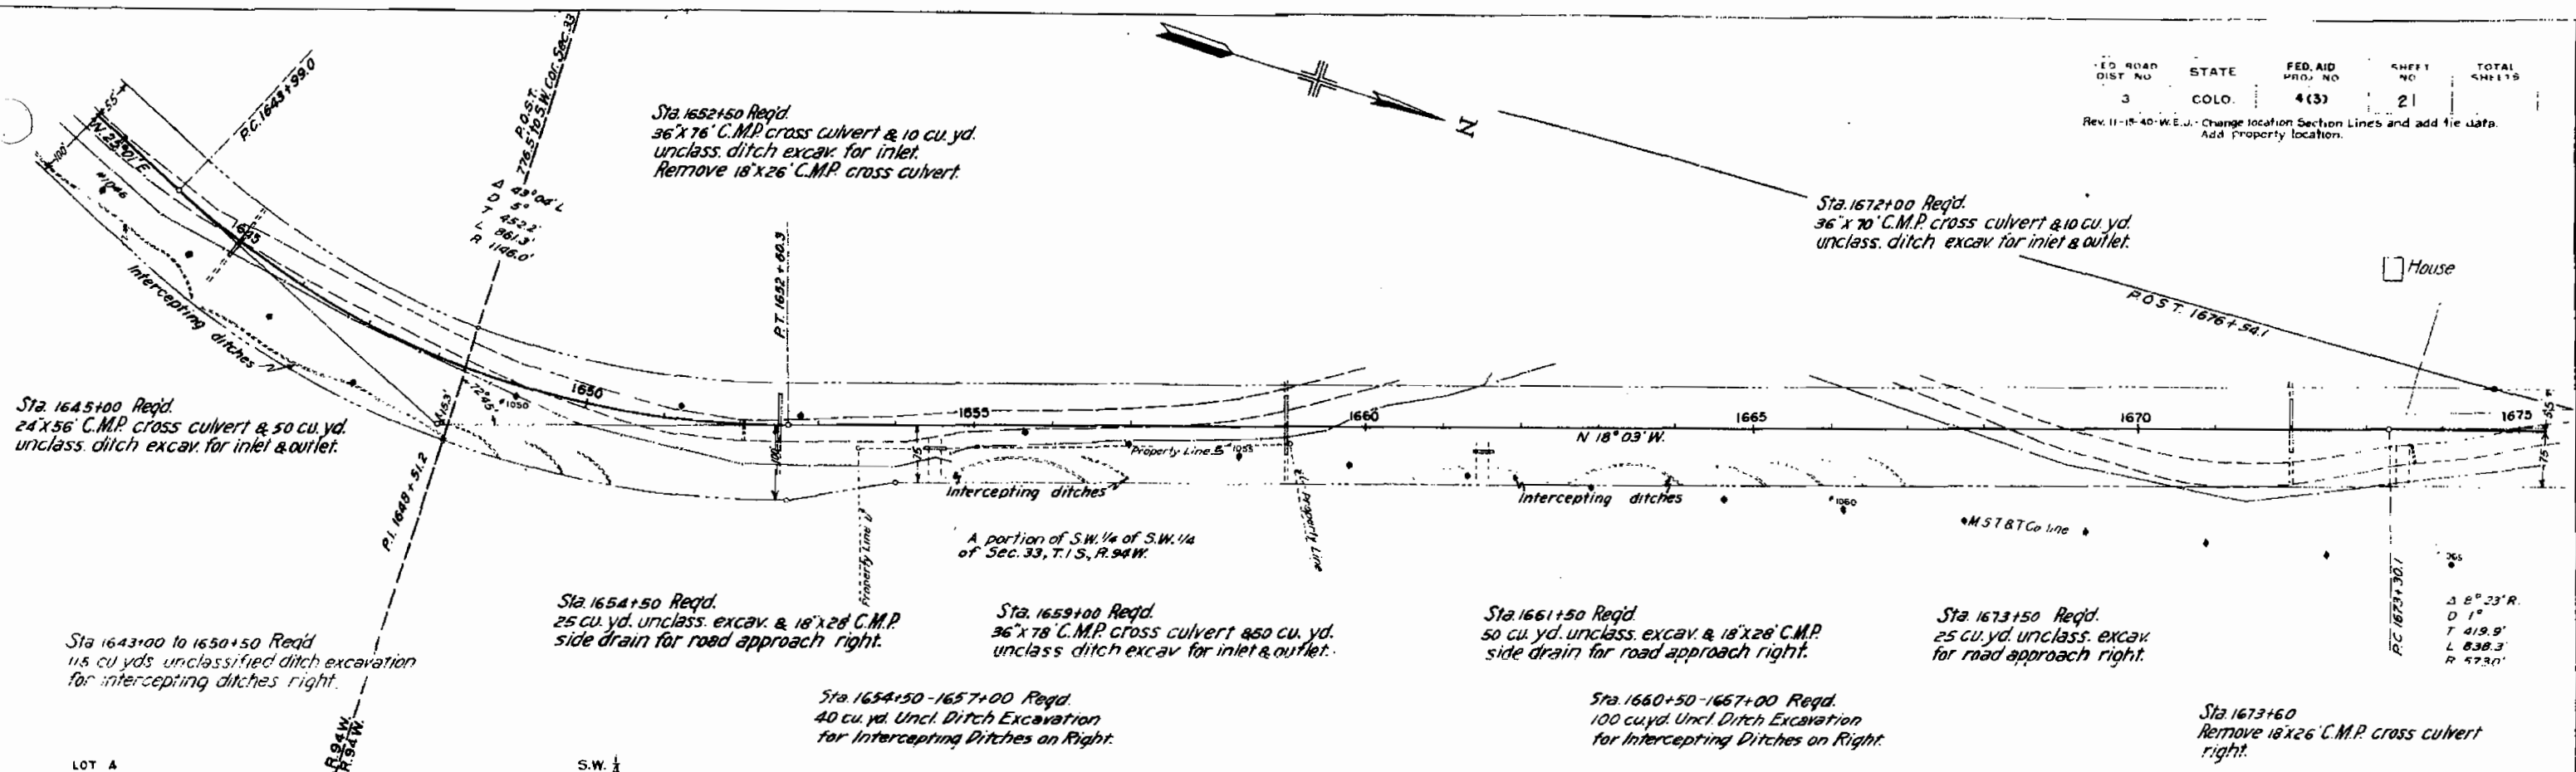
PLAN-PROFILE OF ROAD STANDARD
